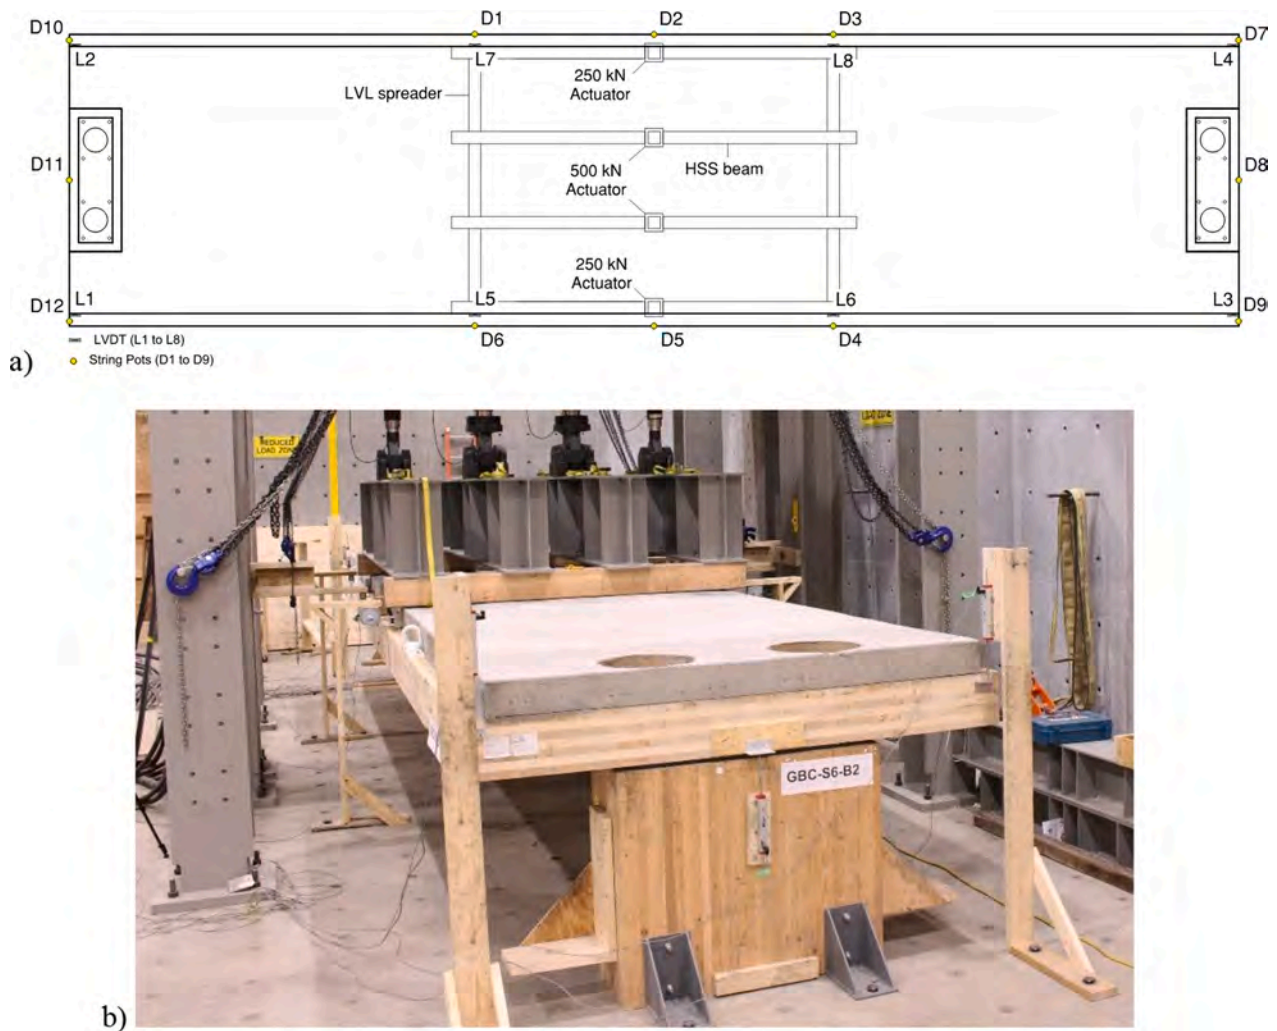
Schematic (a) and photo (b) of a full-scale bending test setup.
